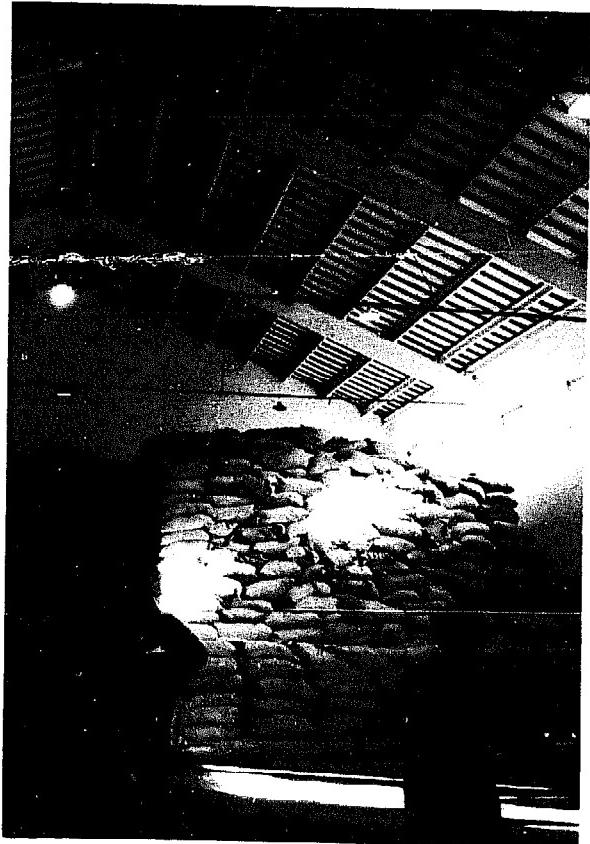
Warehouse for bagged grain, 18 x 60 m. Rafters and purlins in pre-fabricated prestressed concrete; steel tie rods; trusses ca 6 m. (Seventh Depot, Shanghai)
